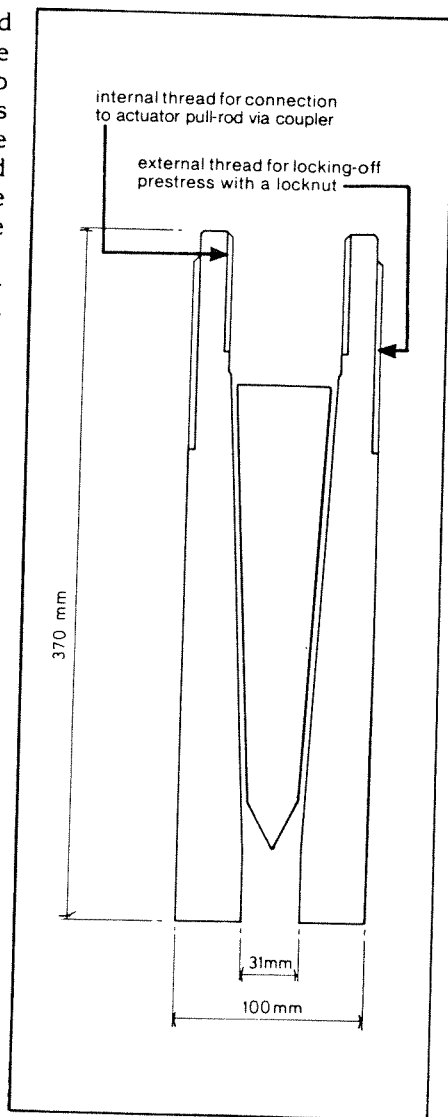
Longitudinal section through 60 tonne Type G terminal, modified for prestressing
